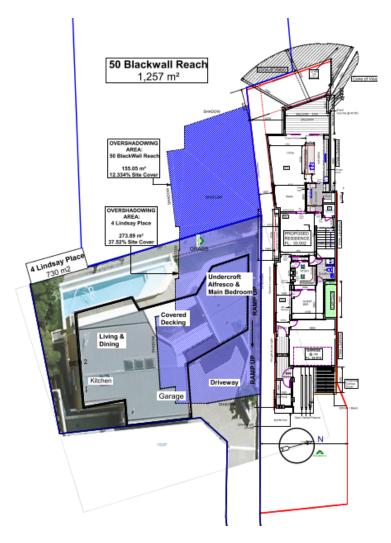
Overshadowing by proposed dwelling on RHS to adjoining southern properties on LHS at No.4 Lindsay Place (with dwelling depicted) and No. 50 Blackwall Reach Parade
